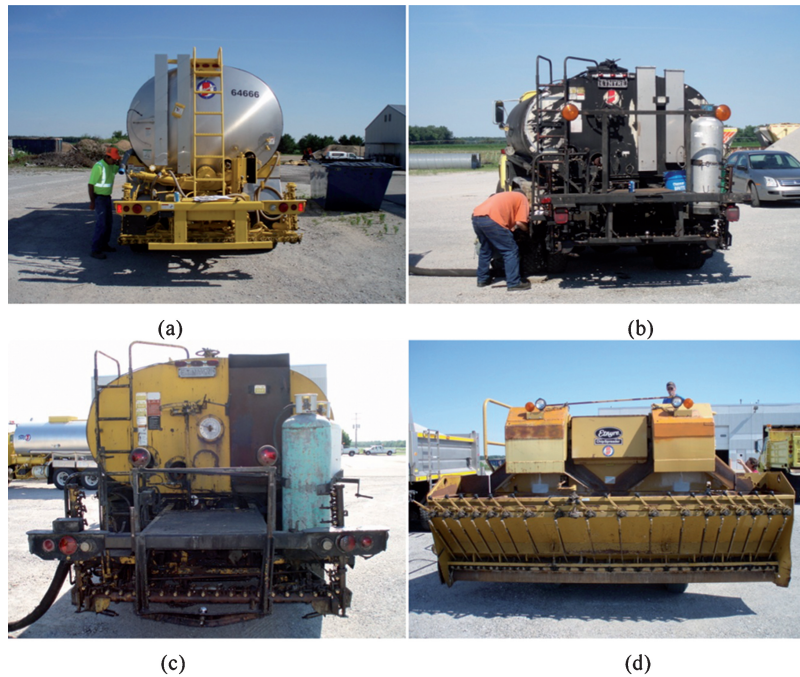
Seal coat equipment: (a) 64666 distributor; (b) 64185 distributor; (c) 64462 distributor; (d) aggregate spreader
